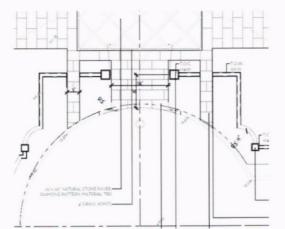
Diagram illustrating proposed vehicle loading area and driveway access.
